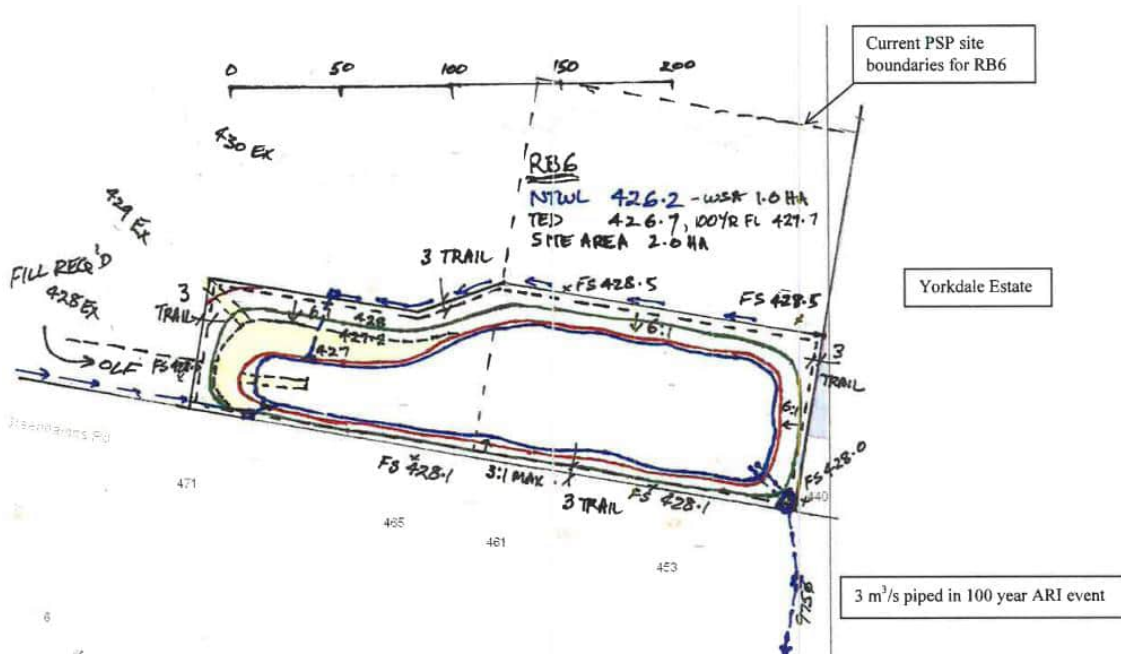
RETARDING BASIN 6 ALTERNATIVE DESIGN LAYOUT – NOT PURSUED
